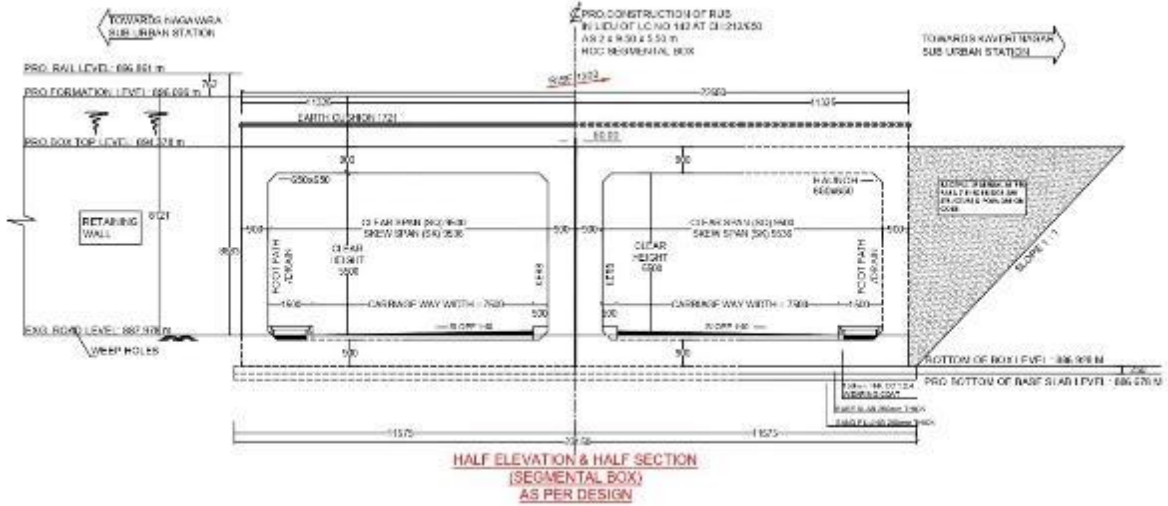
Typical Cross Section of RUB & ROB Proposed in BSRP
